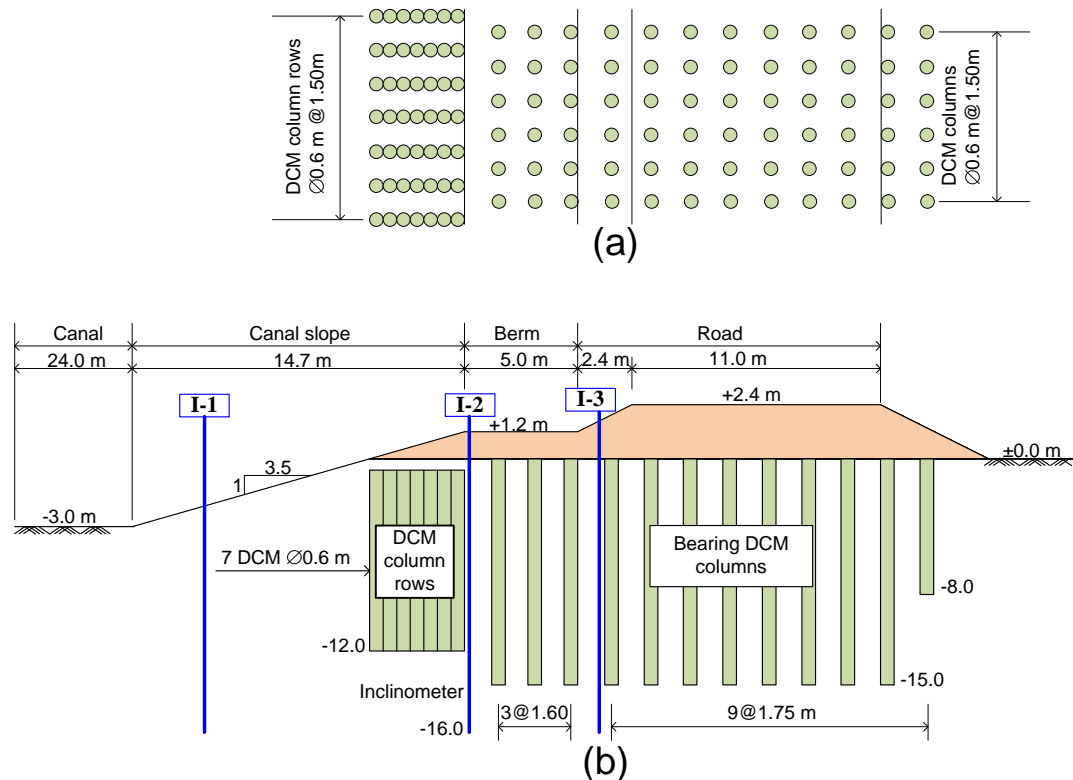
Configuration of drainage canal stabilized with DCM columns: (a) plan view (b) section view
